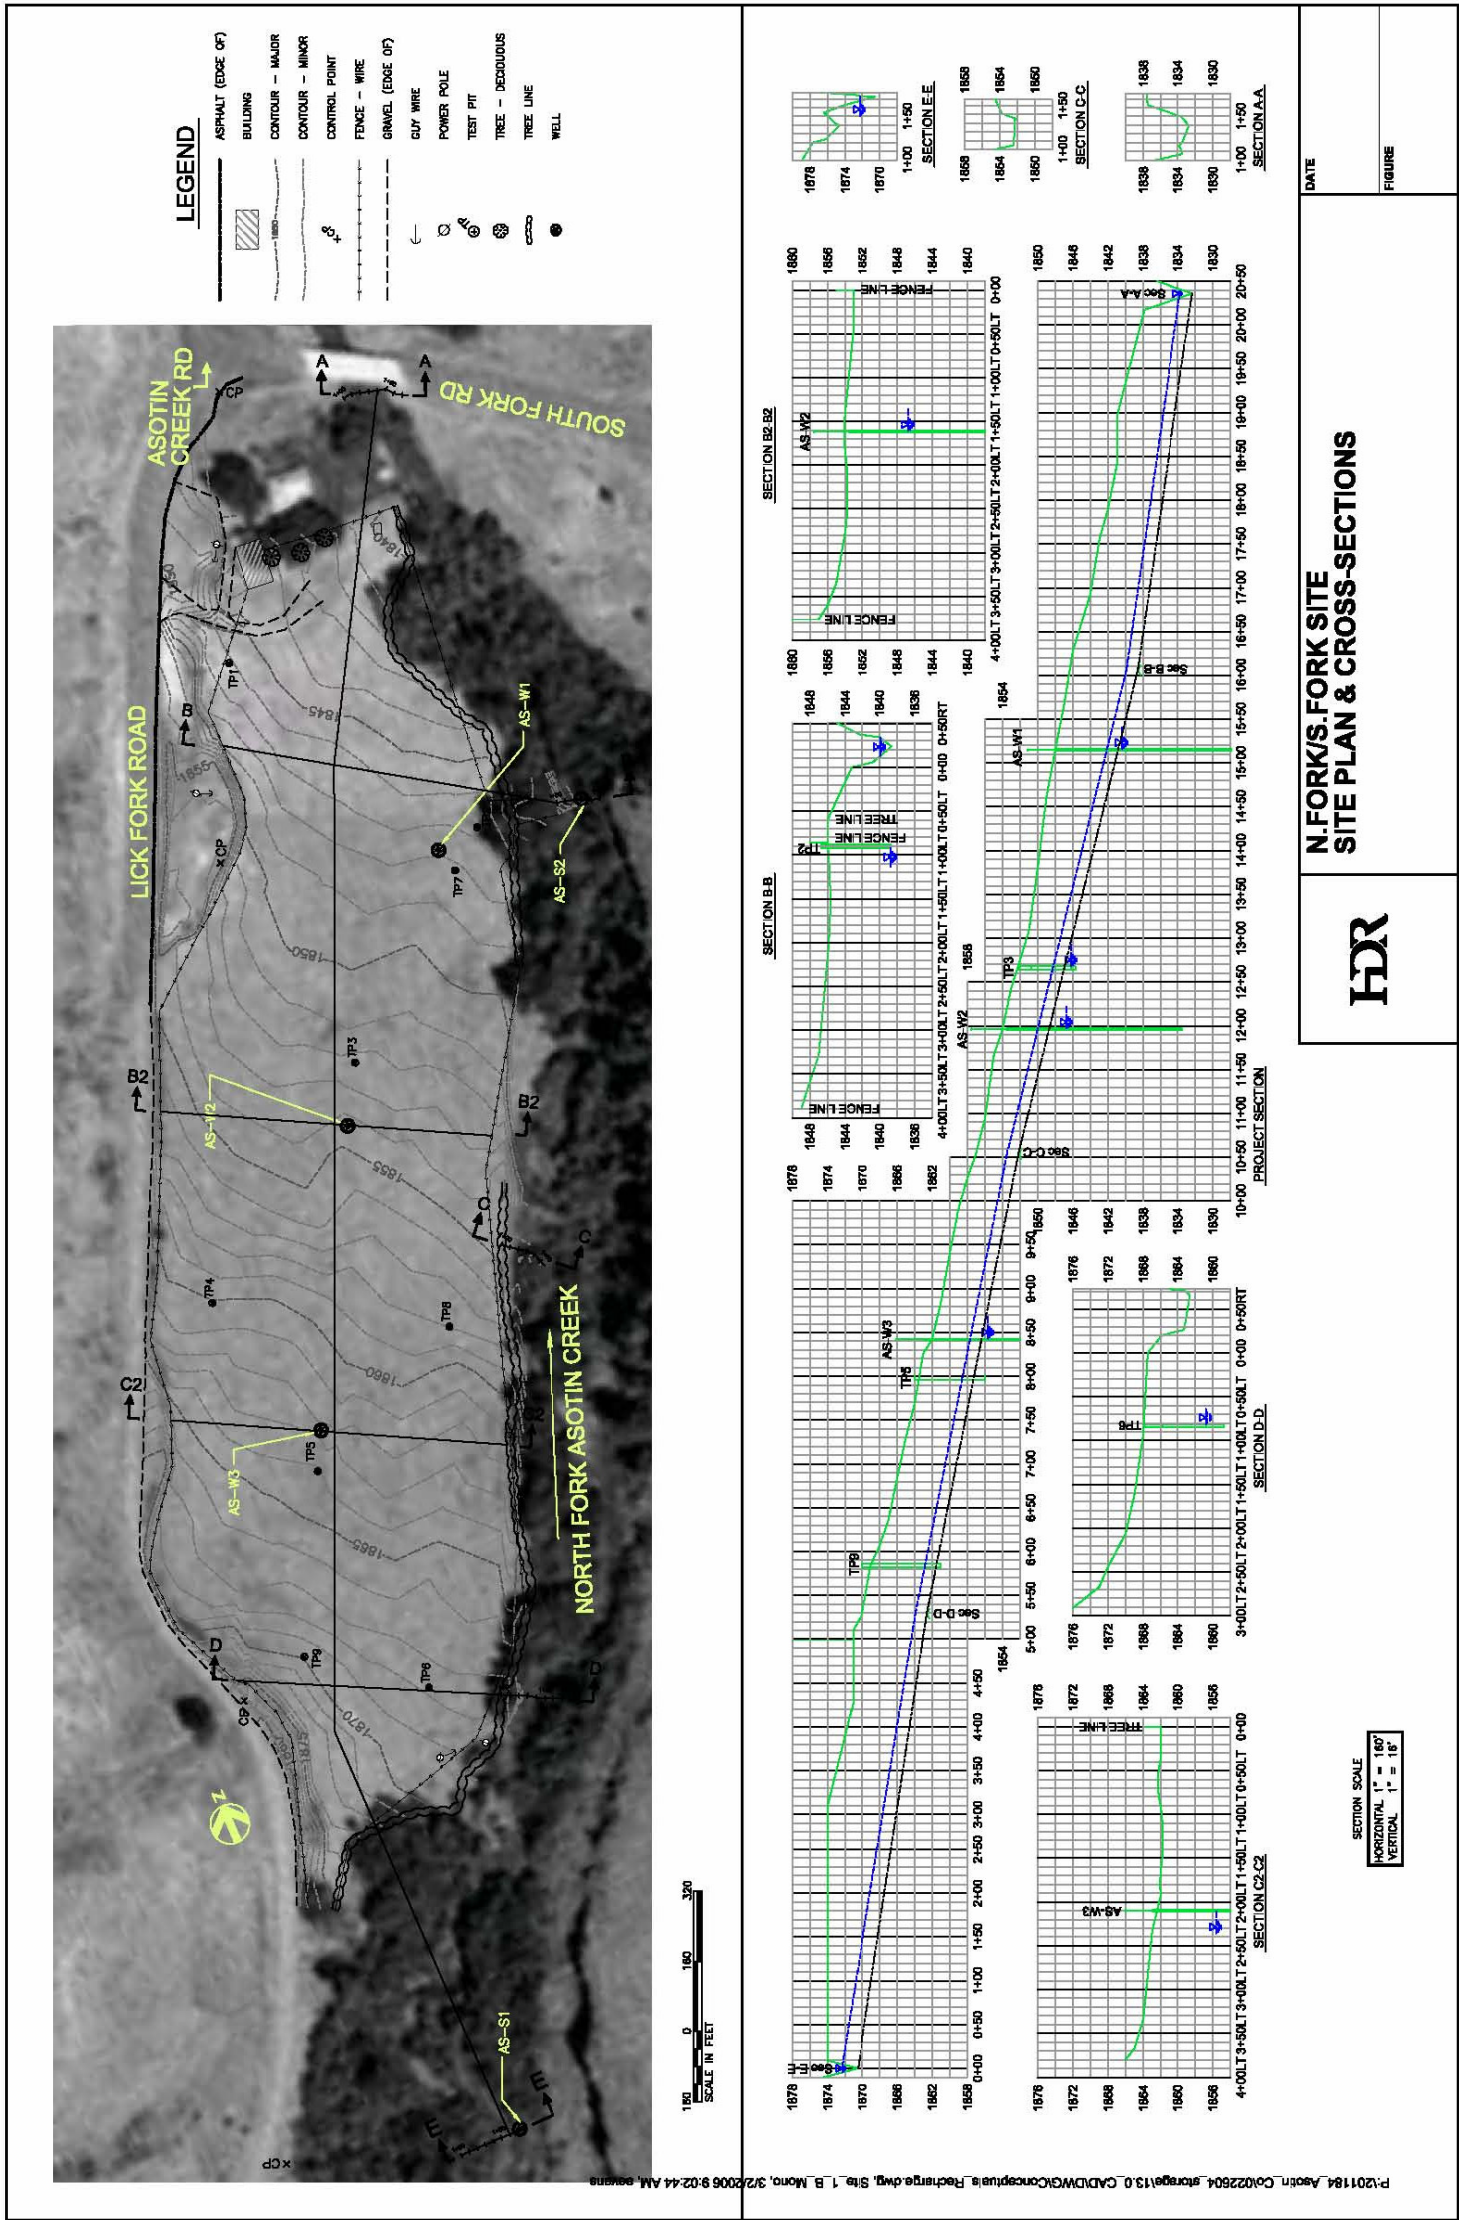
Site plan, topography and cross-sections for Site 1 - N. Fork/ S. Fork Site
